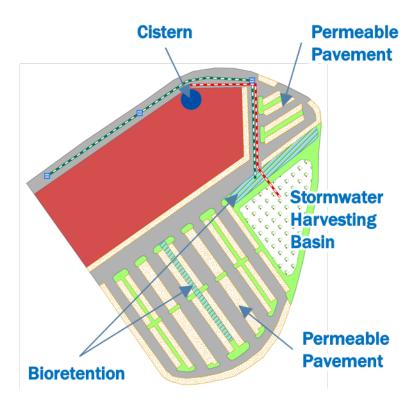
Example site layout with green infrastructure (GI) stormwater management approach.
